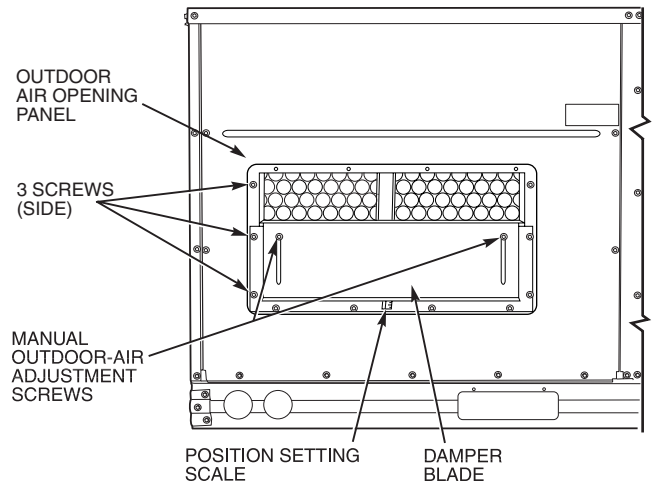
Damper Panel with Outdoor-Air Damper Installed
